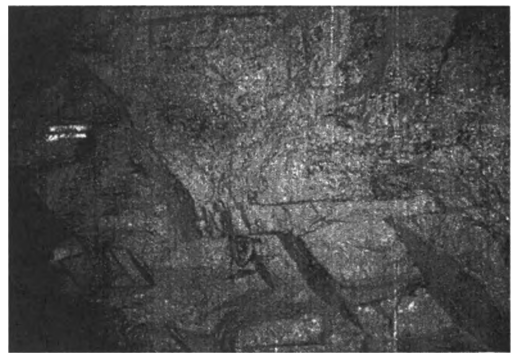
Irregularly shaped quartzite wall treated with Evermine
